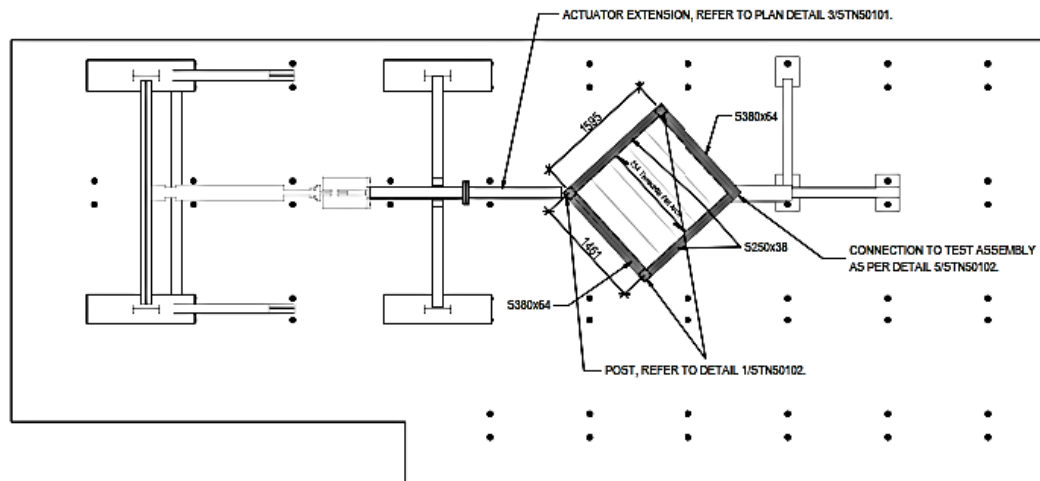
Single panel diaphragms test setup – plan view [4]
